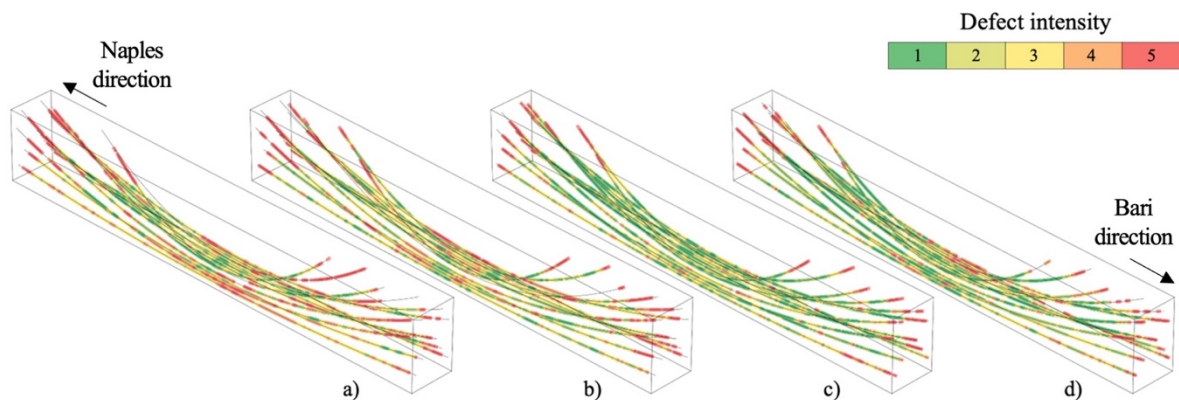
Actual grade of grout fracturing (G.F) of the samples observed during the dissection. (a) Girder T1, 3871 samples; (b) girder T2, 3871 samples; (c) girder T3, 4158 samples; (d) girder T4, 4030 samples.
